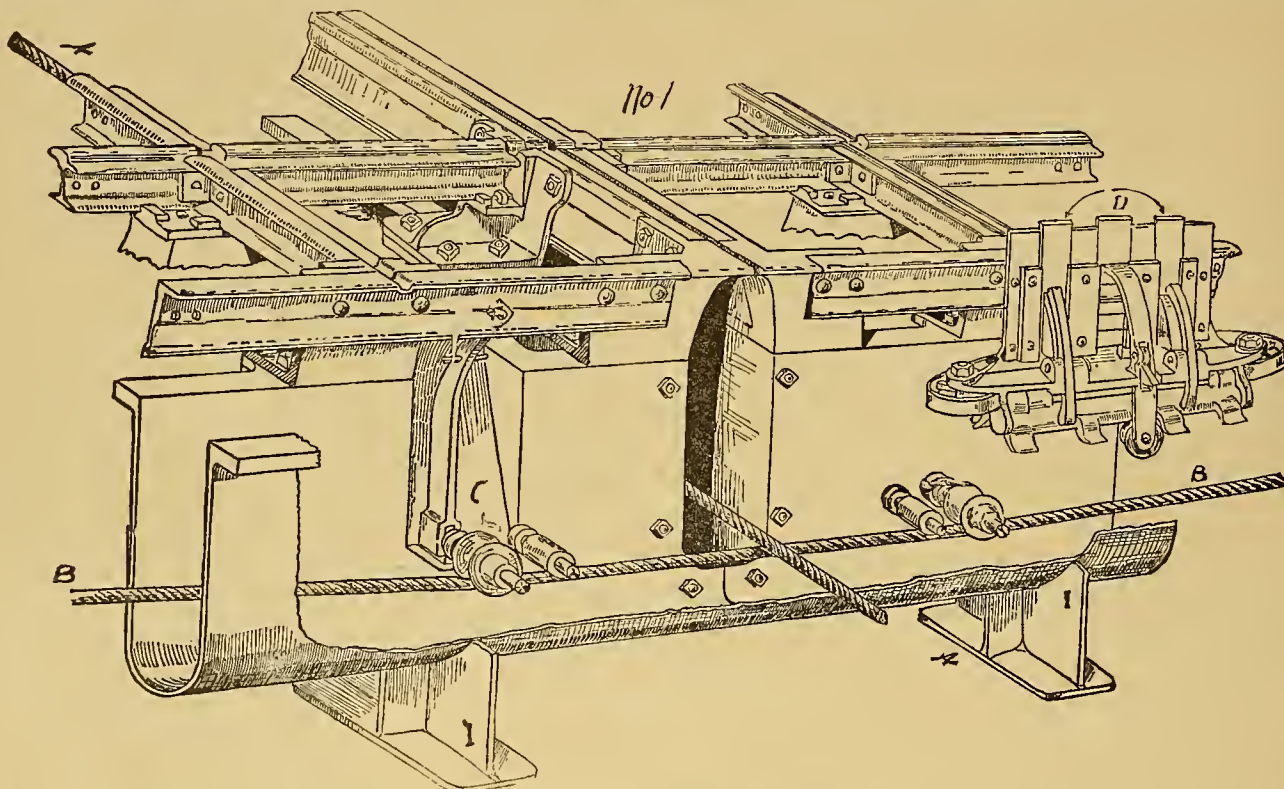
SECTIONAL VIEW OF CABLE CROSSING.
